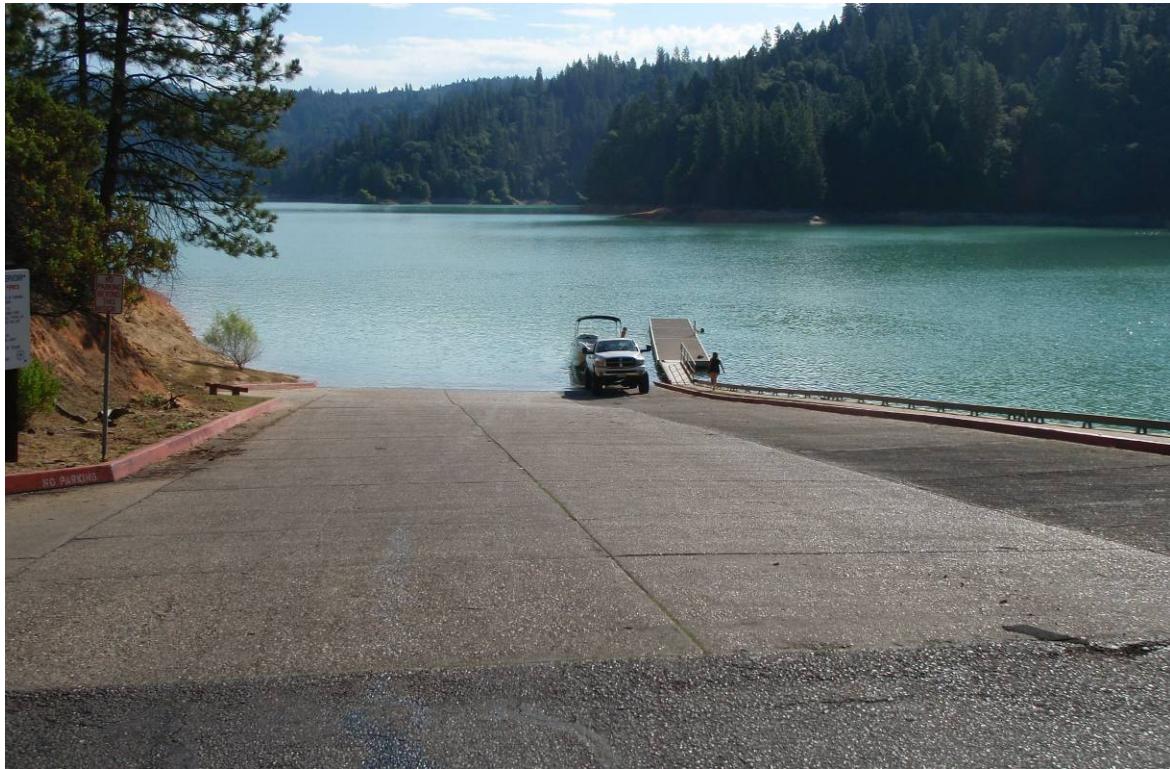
Dark Day Boat Launch, New Bullards Bar Reservoir.
